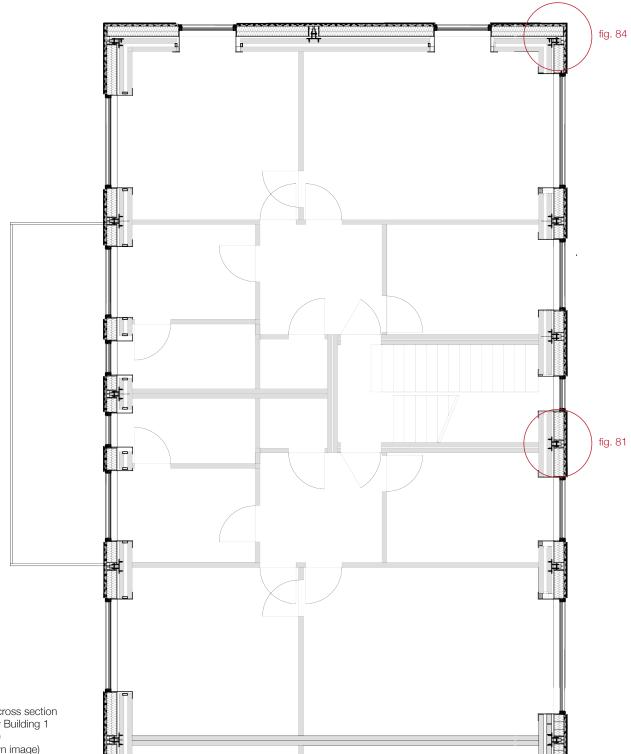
Horizontal cross section Case Study Building 1 scale 1:100 (source: own image)
